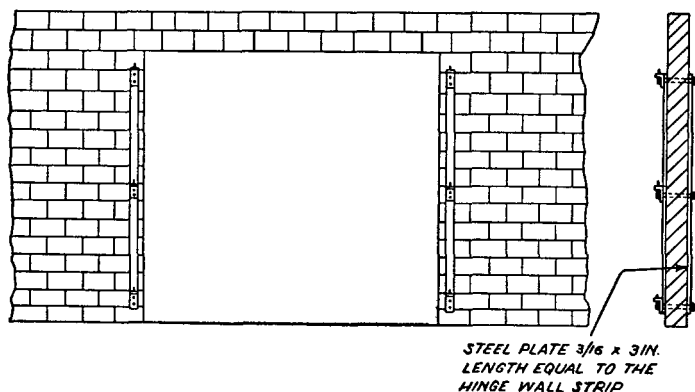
Concrete block wall prepared for doors swinging in pairs — lap mounted.
